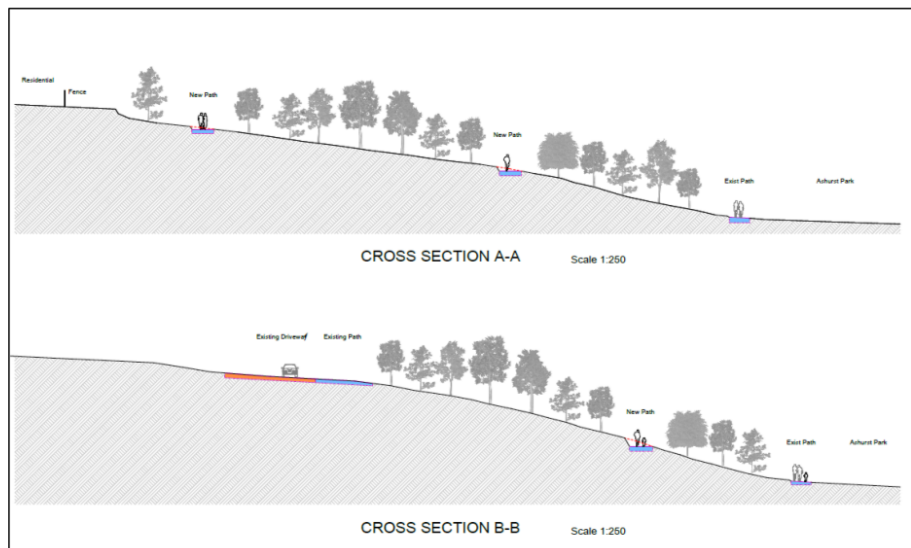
Cross Section for Potential New Access off Church Road for Te Rapa Sportsdrome site options (2A and 2B)
